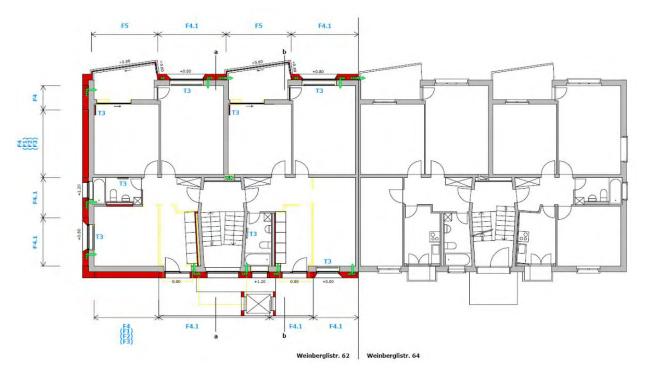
Layout plan of the ground floor, first and second level (with eat-in kitchen instead of small rooms and separate kitchen)
